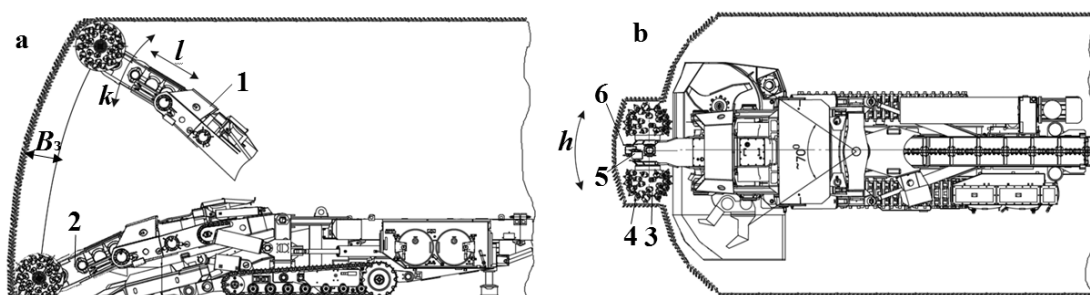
View of multipurpose roadheader operation: a – side cutting view; b – top view after cutting
